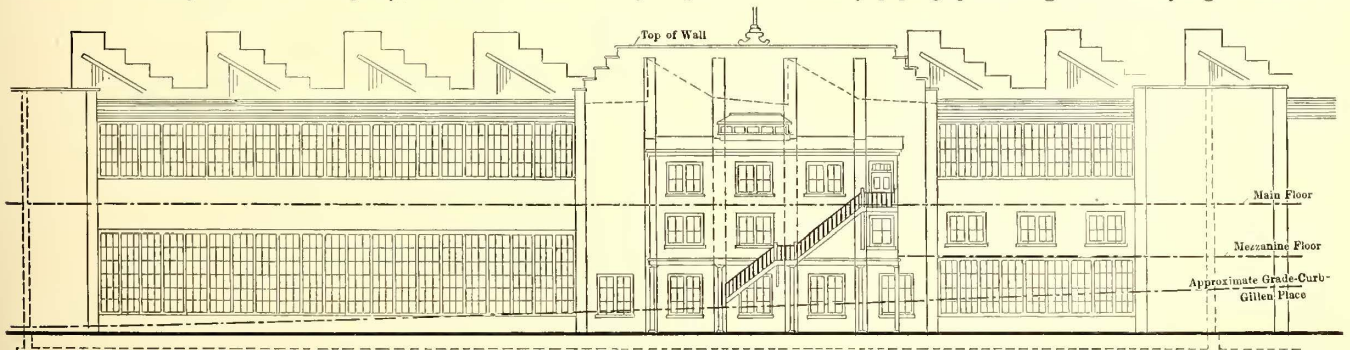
PARTIAL ELEVATION ON THE GILLEN PLACE OR EASTERLY SIDE OF THE MAIN EAST NEW YORK SHOP BUILDING, SHOWING THE LARGE WINDOW AREA, AND ALSO THE POSITION OF THE OFFICE BUILDING
